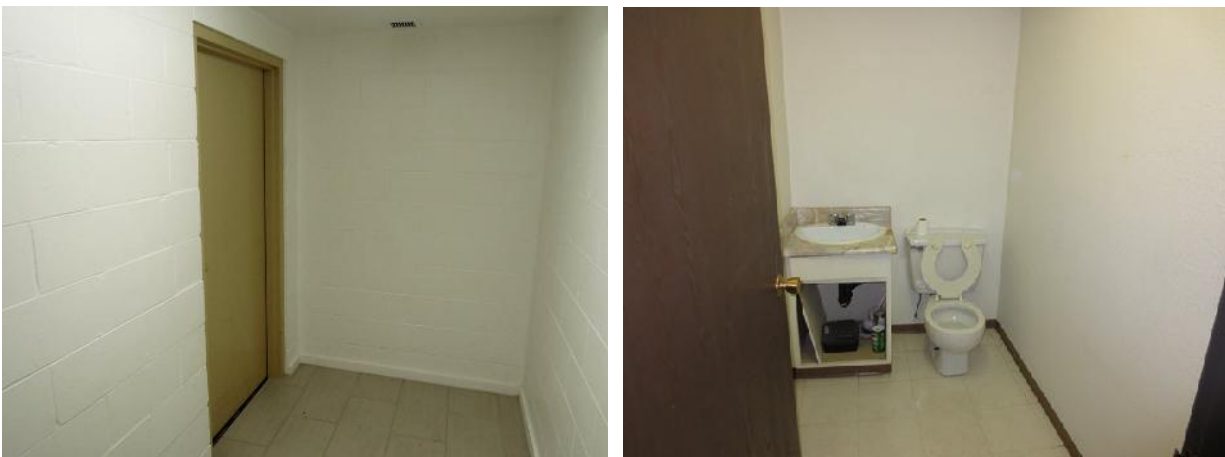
The vestibule between one basement hallway and the parkade (left). A washroom with toilet and sink (right).
